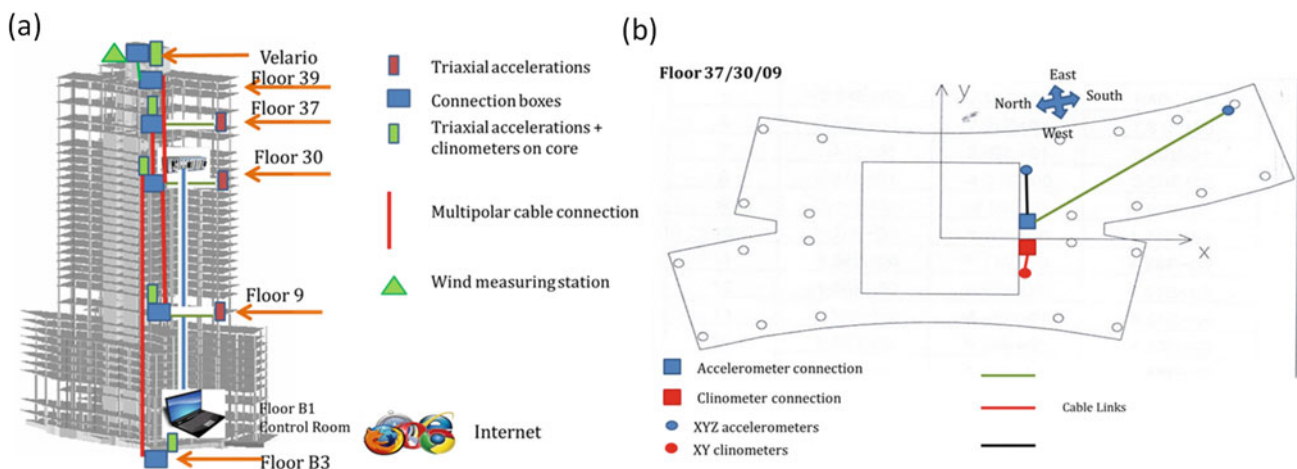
Instrumented floors (floor B3 is the third floor underground) (a) and sensor layout on some instrumented floors (b)
